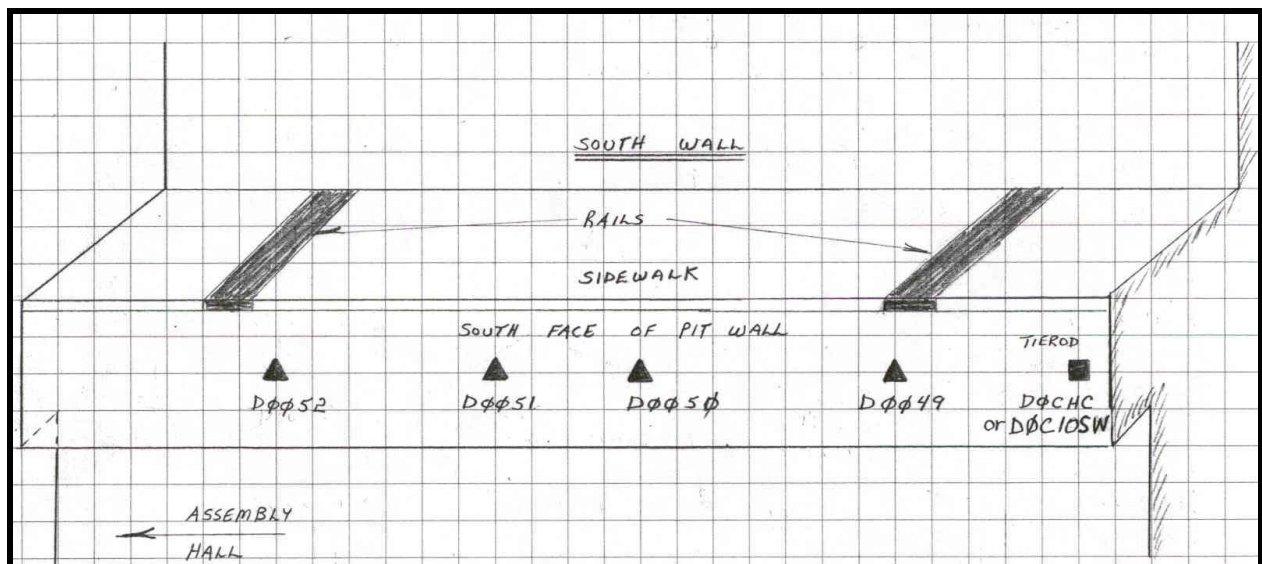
South Face of Pit Wall of Collision Hall with Controls
